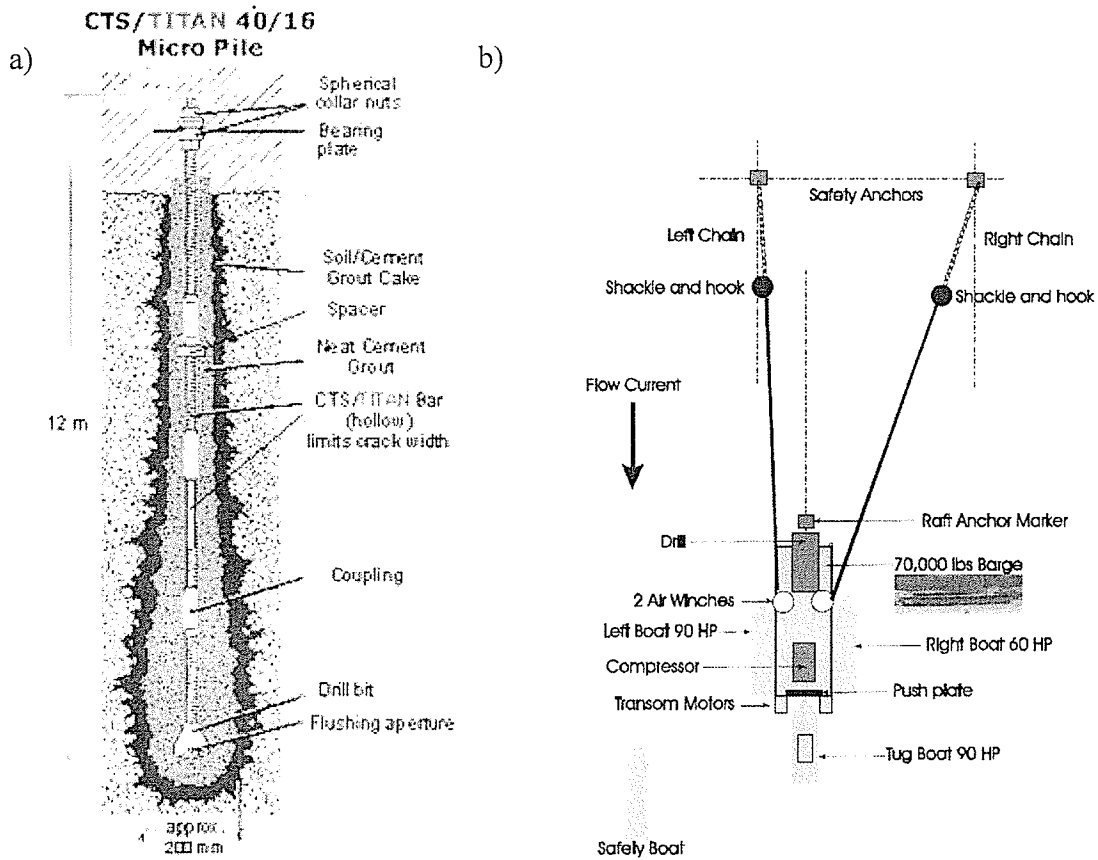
a) Cross-section of imbedded anchor and b) drilling rig set up on the water
